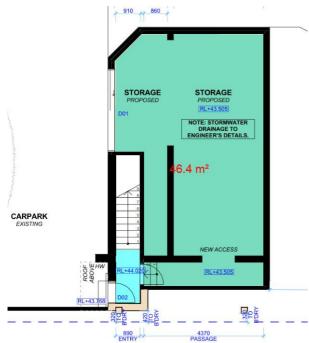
Proposed Garage Level amended to demonstrate increase in floor area (shaded blue). Source: Action Plans.
